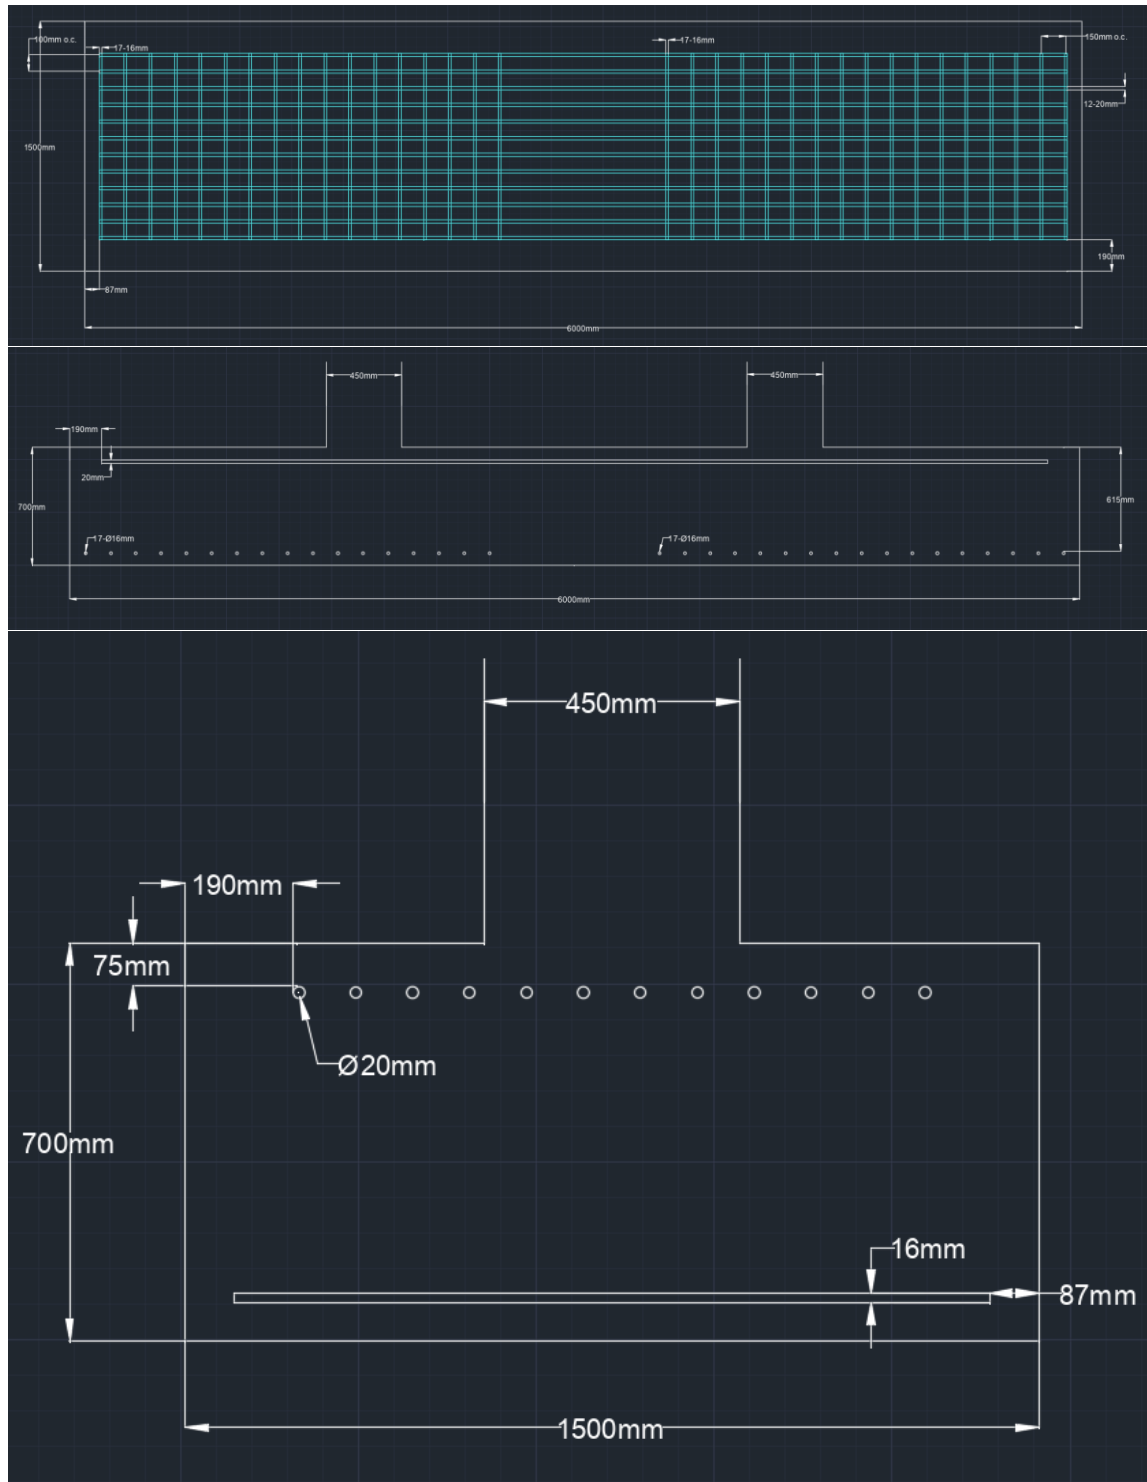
sketches for the combined footing Figure 6.4.3. Top View of Final Design of Combined Footing
